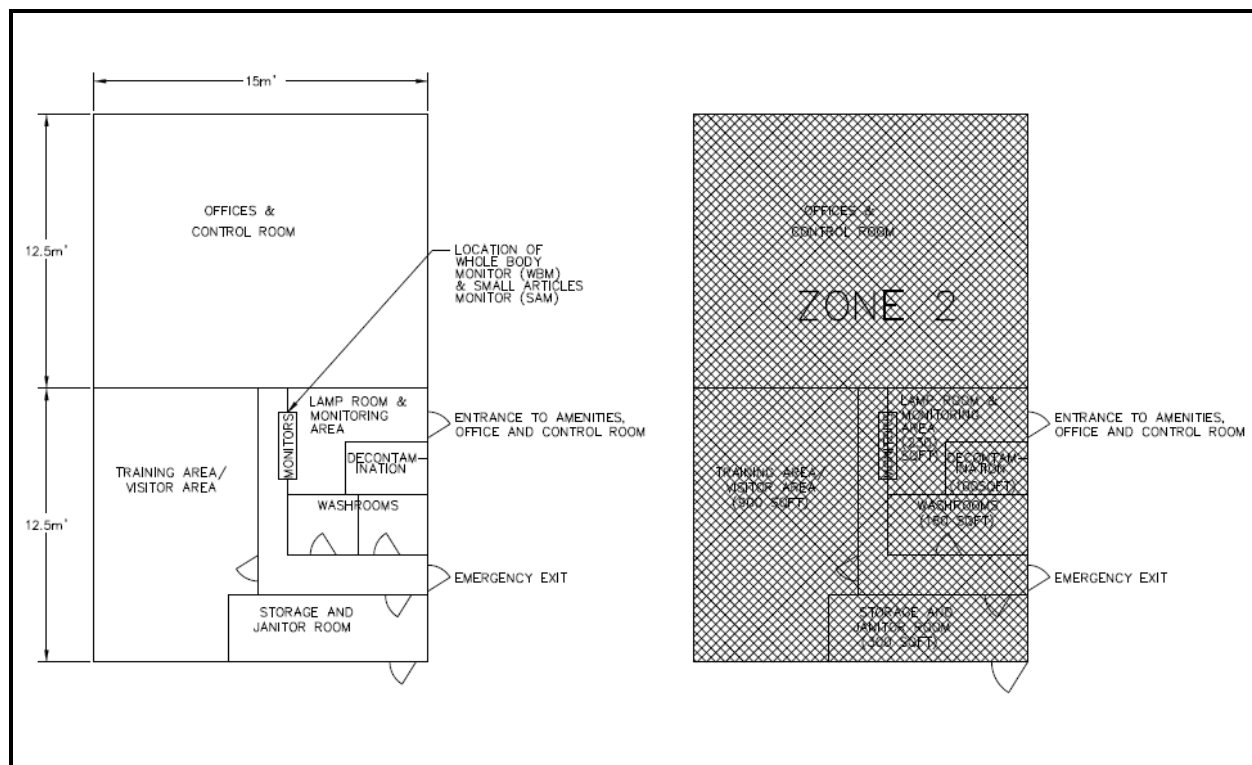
Plan of Amenities Building Showing Radiological Zone 2
